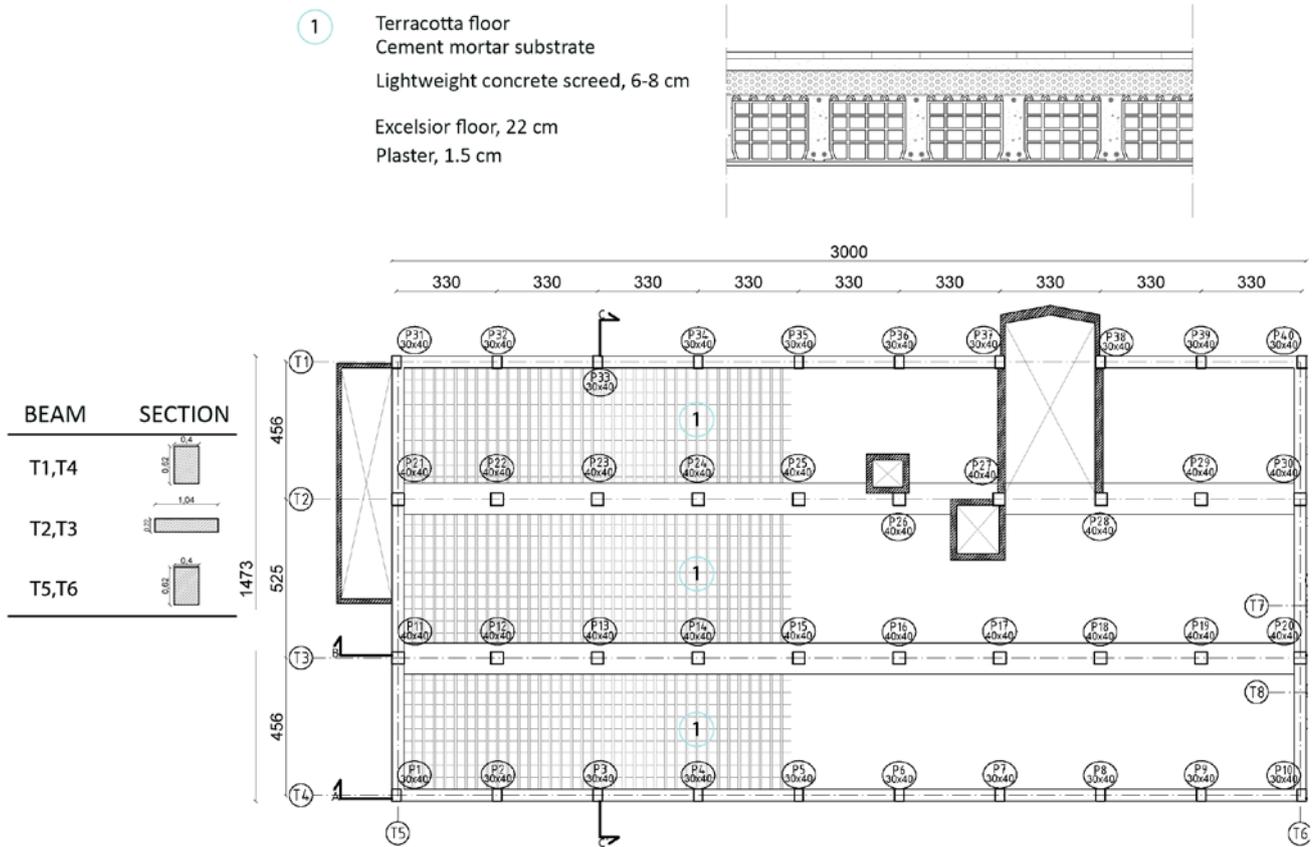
Structural plan of the first floor (graphic elaboration by Greta Casi).
